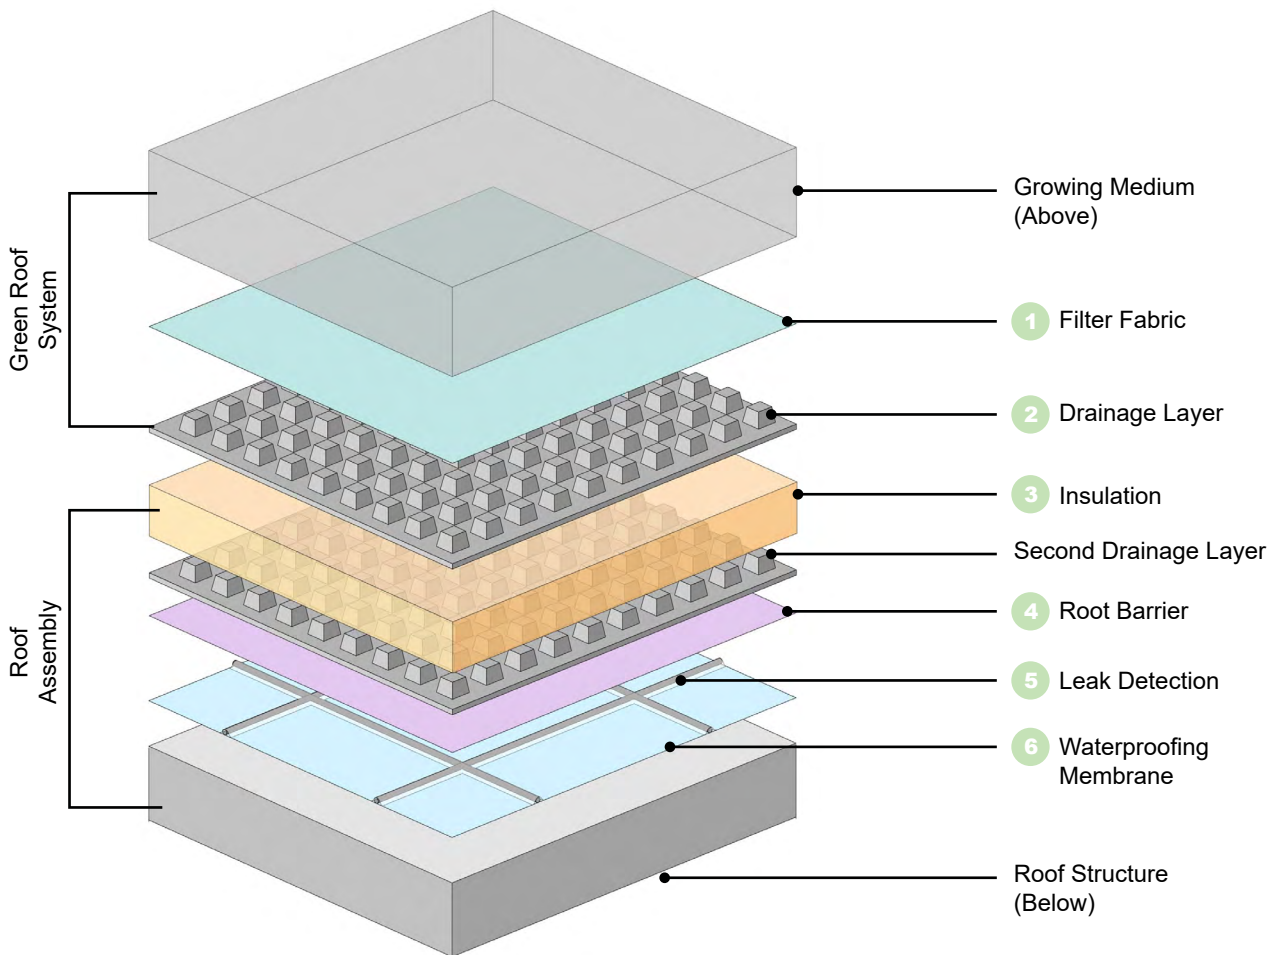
Example of green roof build-up supported by a protected roof assembly
